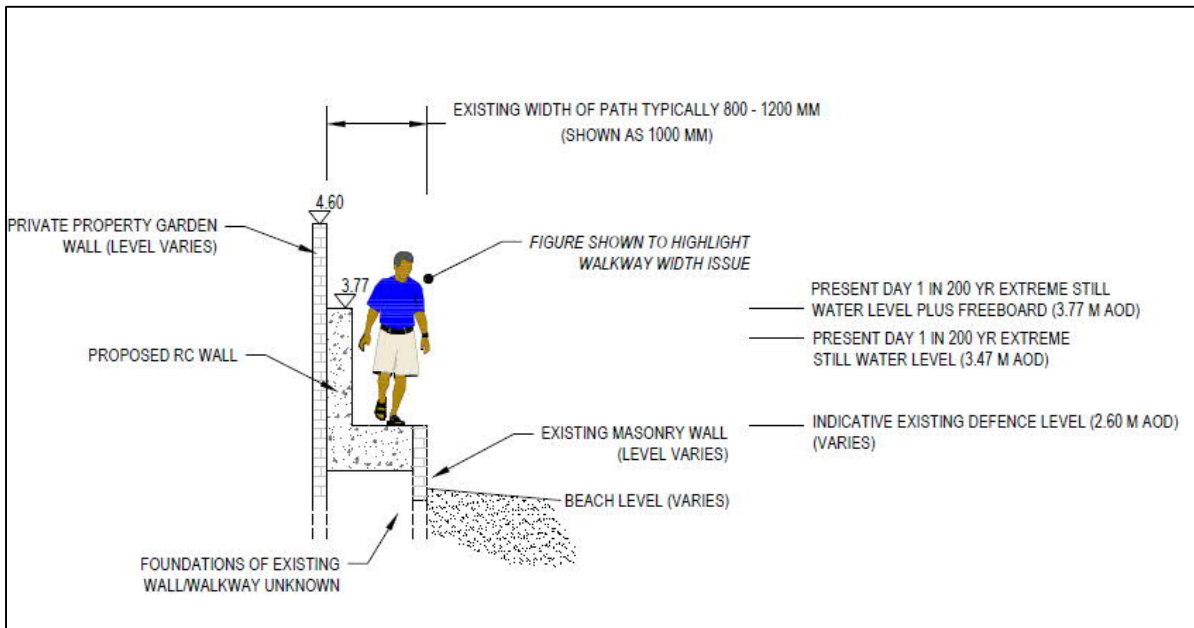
Sketch illustrating unfeasible footpath width should boardwalk not be installed (not to scale).
